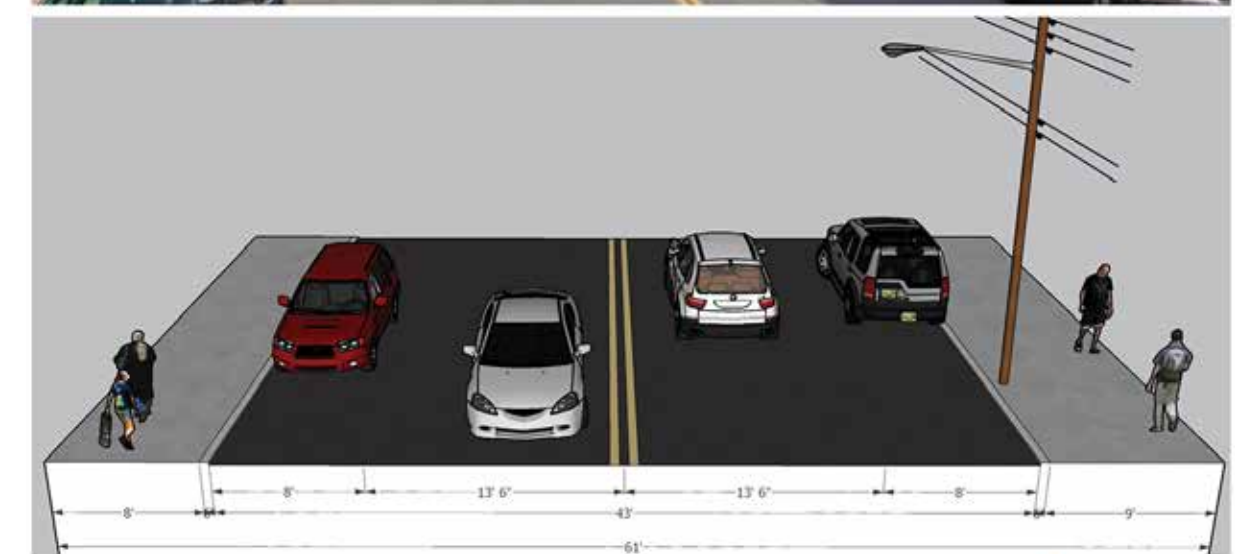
Crane Street : Yorkston St to 3rd Ave Design Concept Cross-Section
